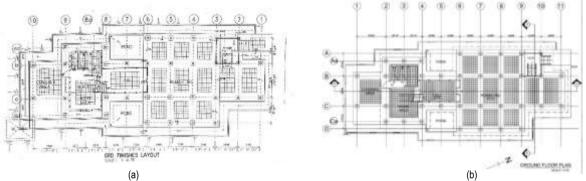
(a) Paper-sketch drawing (blueprint) of RUM; (b) Recreating original drawing of ground floor plan to 2D Drawing.
